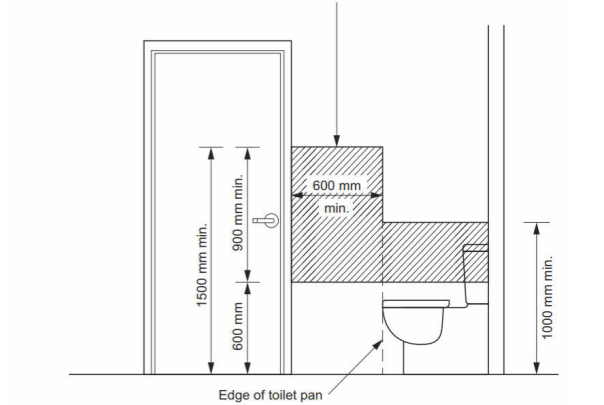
Minimum extent of sheeting for wall adjacent to a toilet pan
